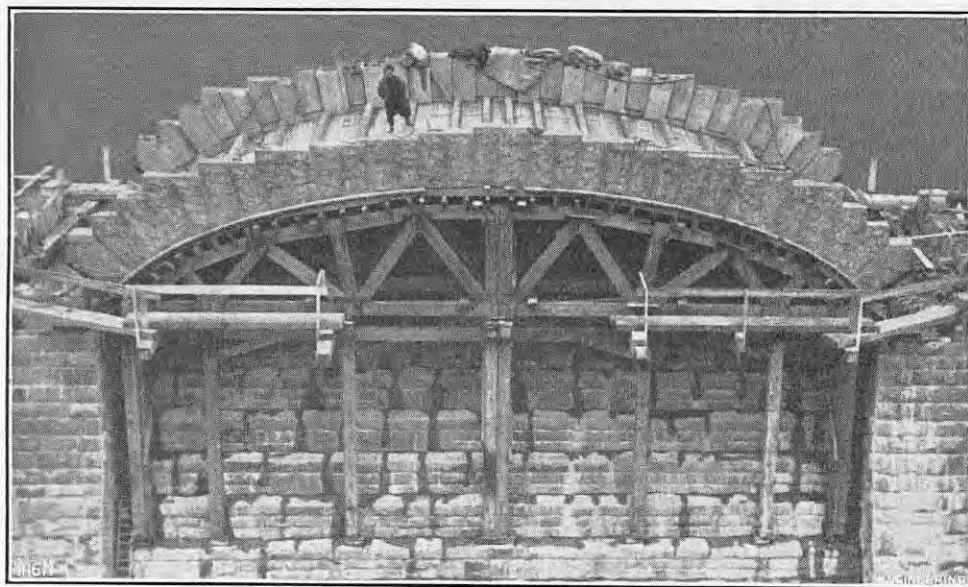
CONSTRUCTION OF CENTRAL ARCH OVER SPILLWAY.
